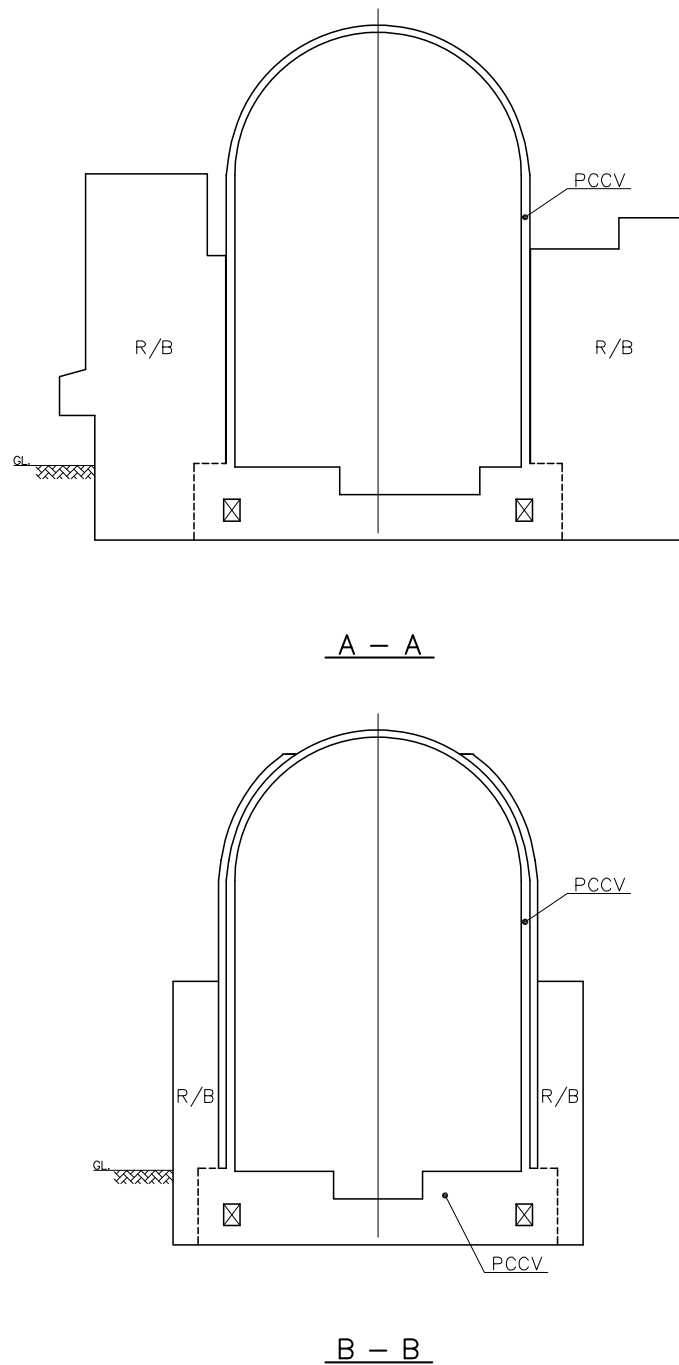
US-APWR Building Configuration (Section Views)
